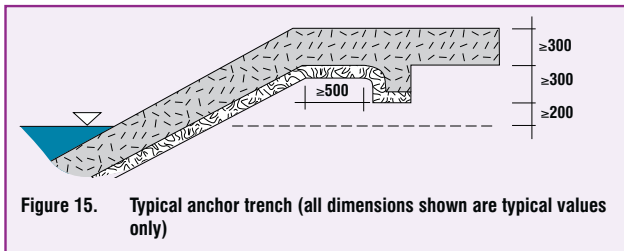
Typical anchor trench (all dimensions shown are typical values only)
